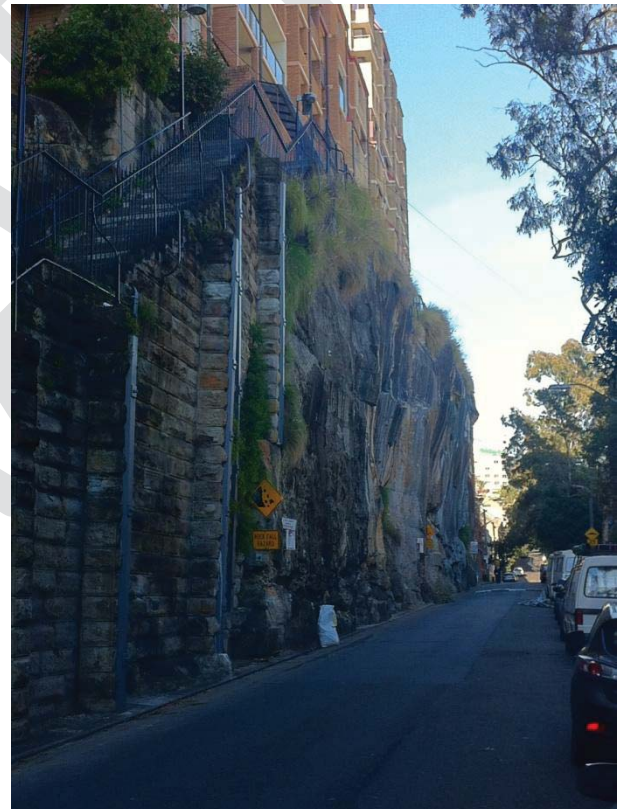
Vertical drop from Victoria Street properties to Brougham Street
